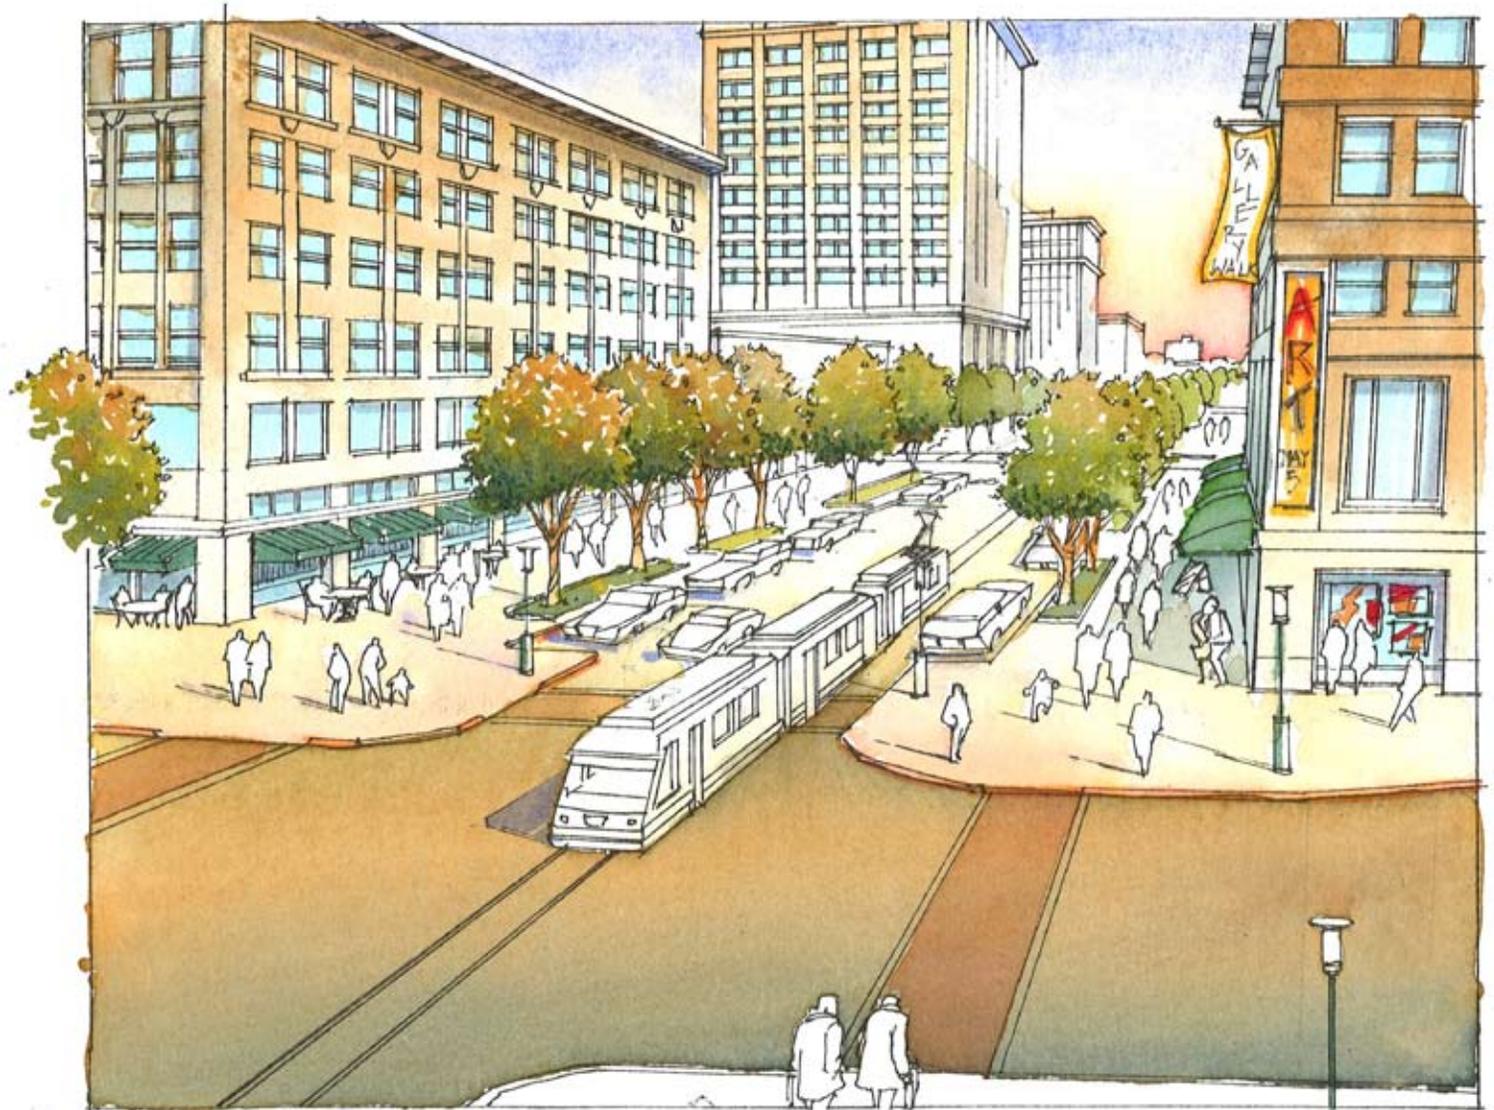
h Street returned to its historic prominence with the addition of the streetcar, streetscape design, on-street parking and new ground level uses
